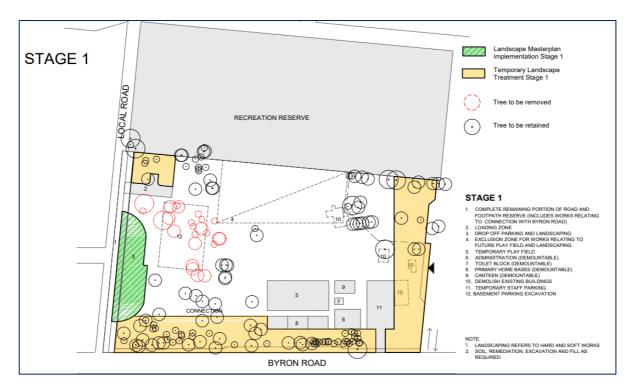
| Stage 1 landscape plan – as approved (Source: SSD-9227 Approved Plans)
